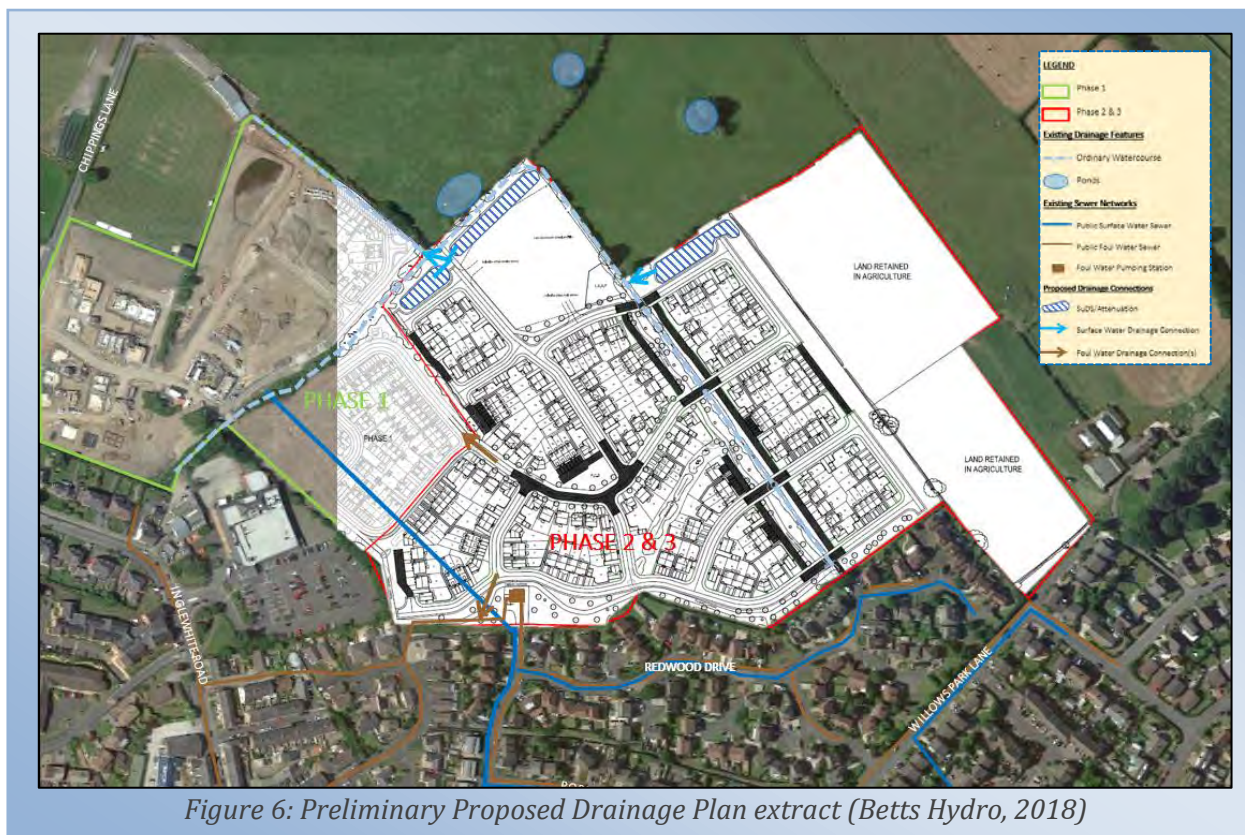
Preliminary Proposed Drainage Plan extract (Betts Hydro, 2018)
